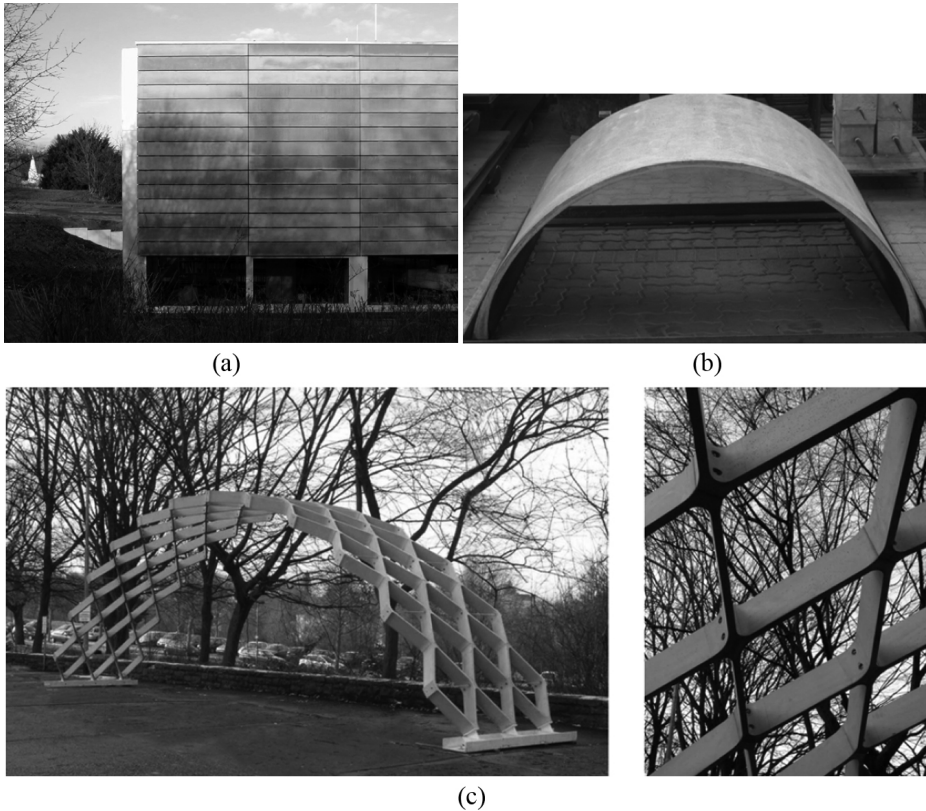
Façade TRC elements applied on the Institute of Structural Concrete at RWTH Aachen University, Germany (a), TRC barrel shell roof element (b) and TRC grid structure (c) [Hegger and Voss (2008)].
